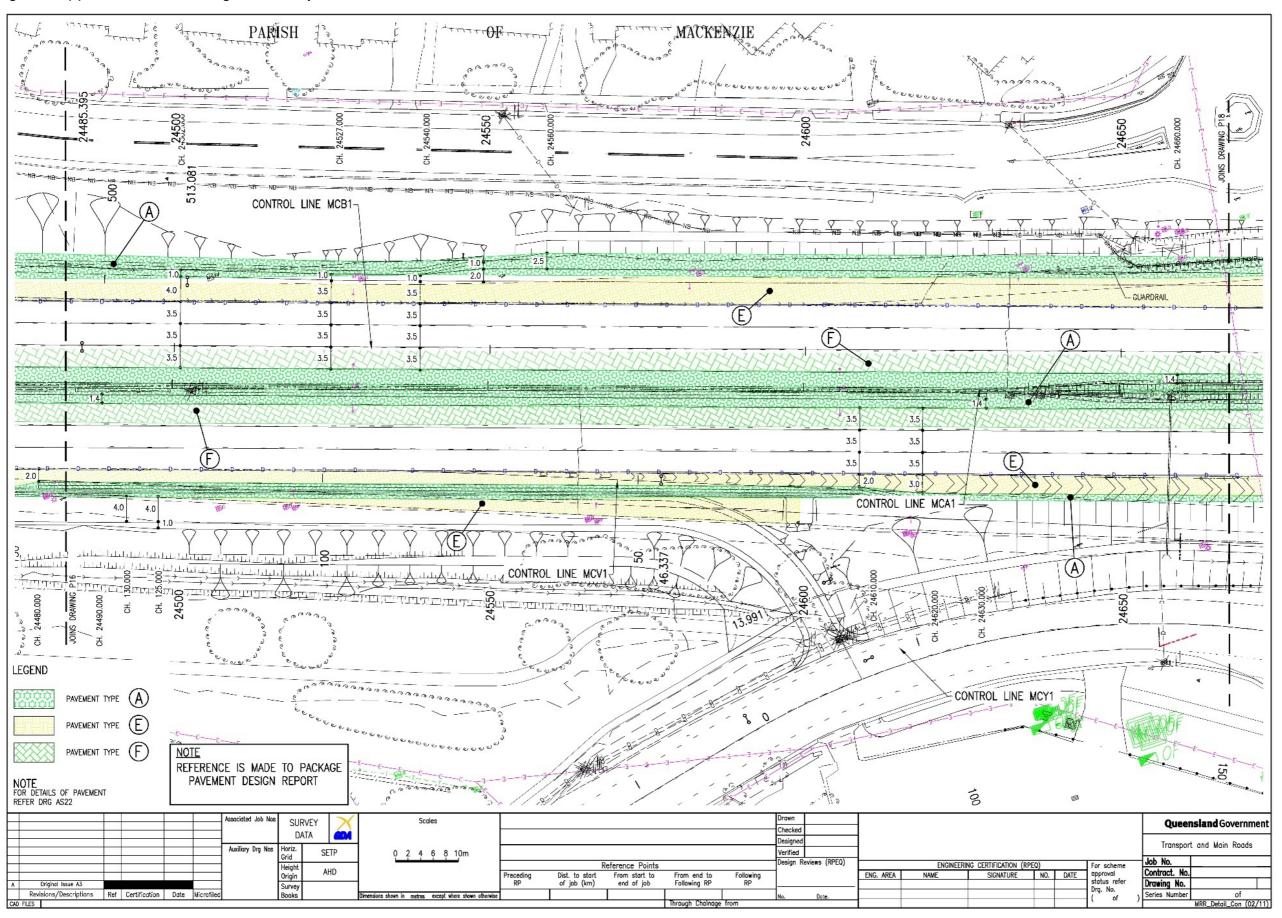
(d) – Pavement details – generic example 3 – sheet 2 of 2
